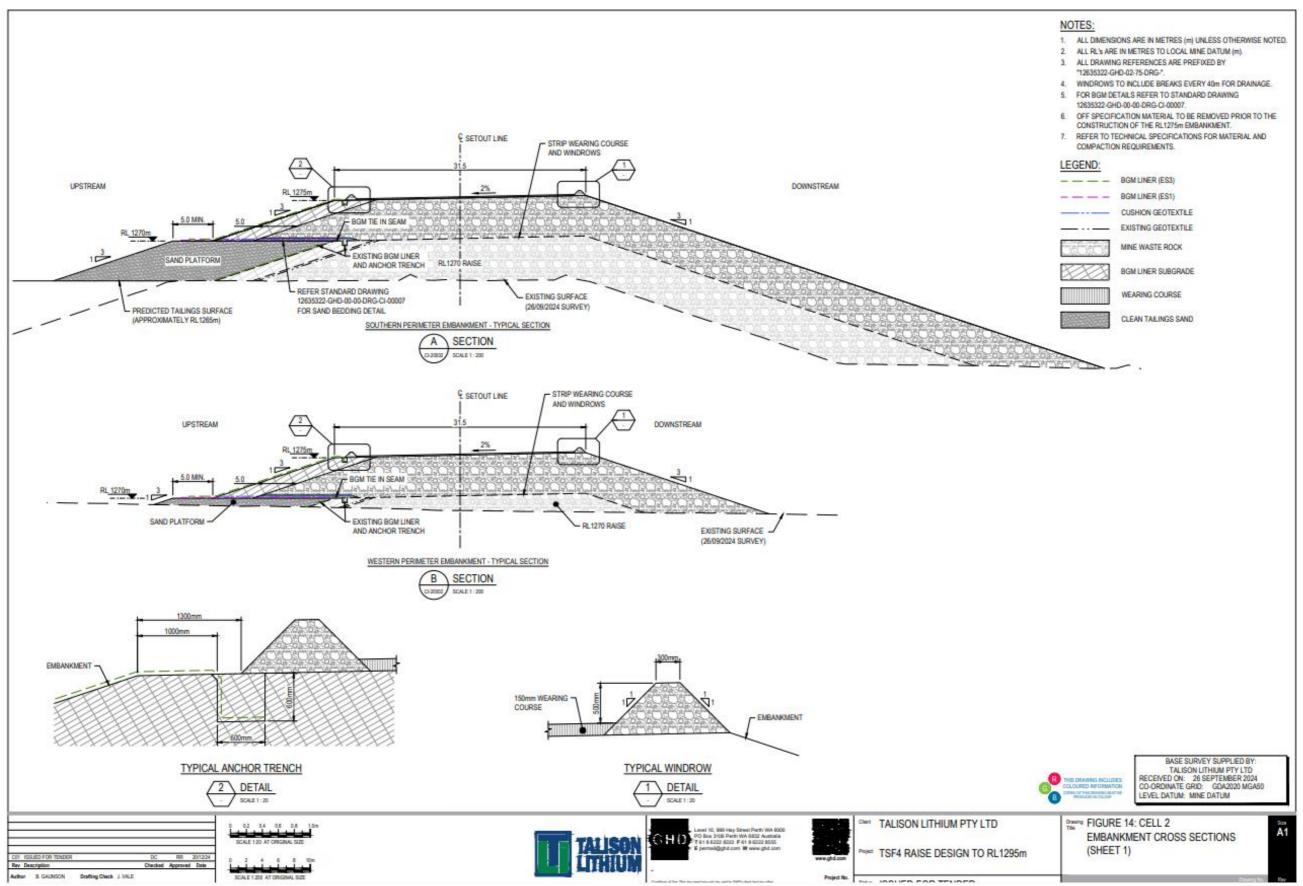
TSF embankment raise to 275 m AHD / 1275 m RL - Cell 2 typical embankment section detail
